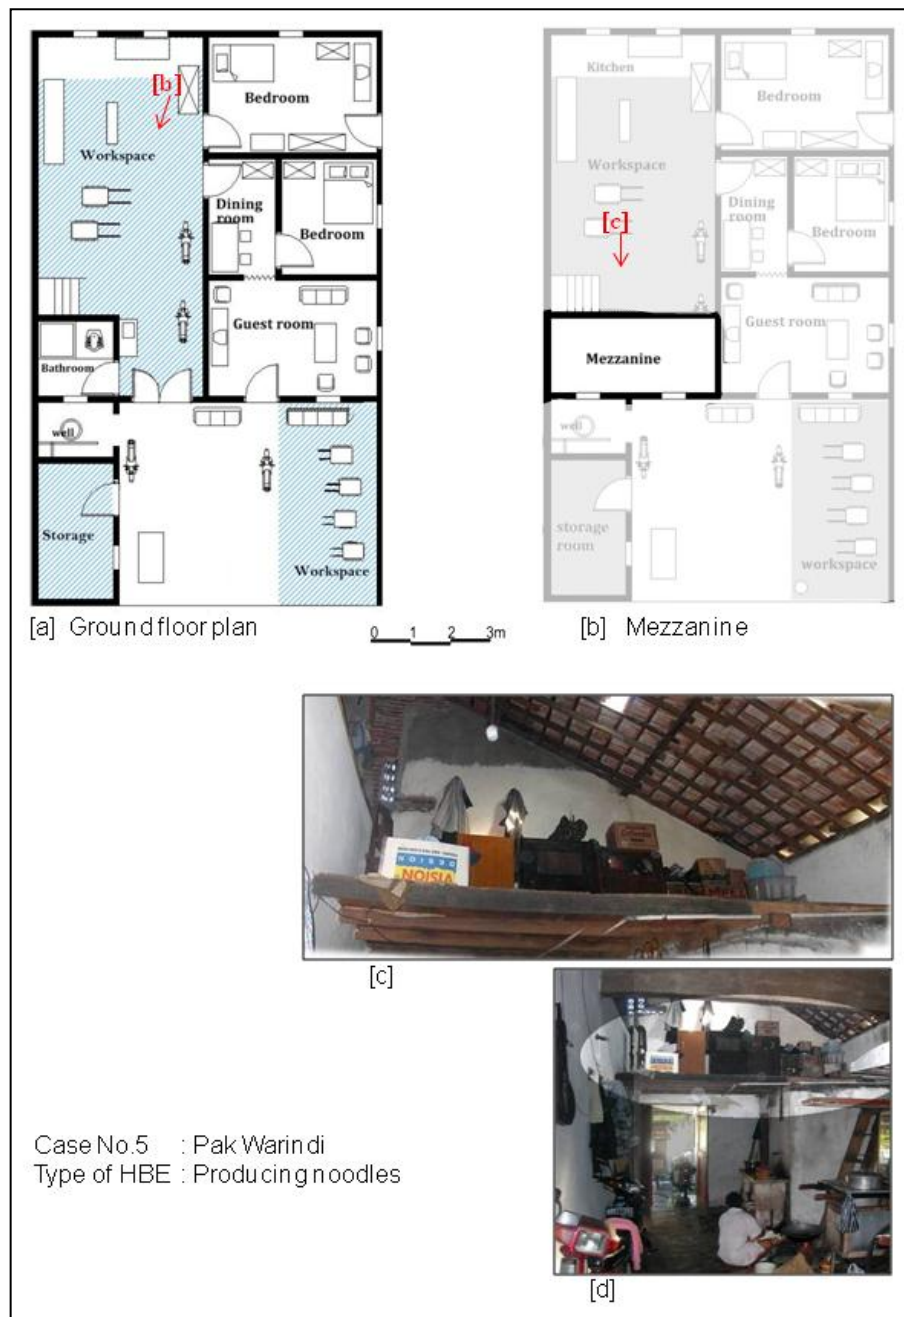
An example of a mezzanine for a workers' sleeping space – Case No.5
